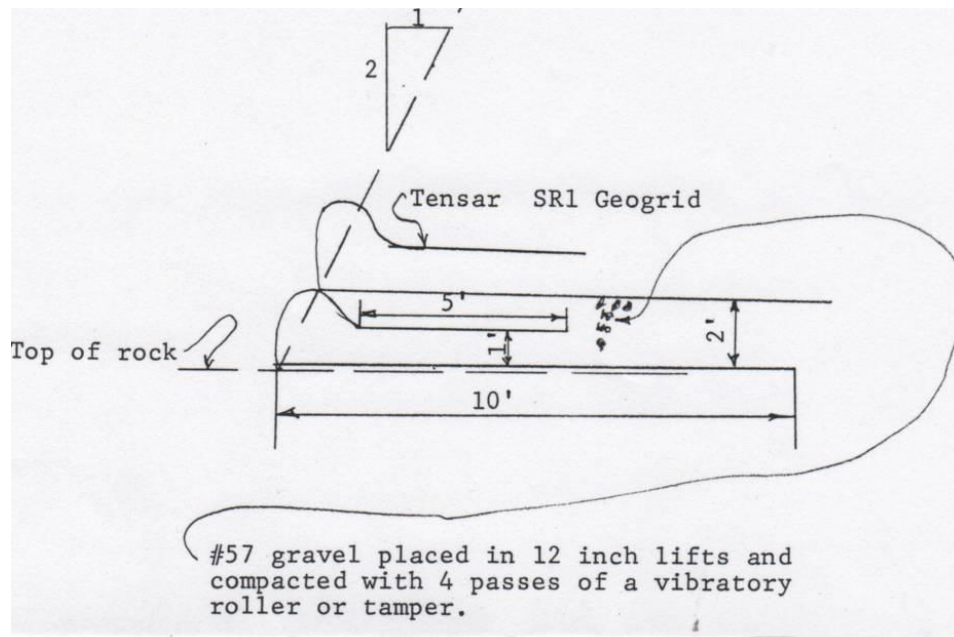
Schematic construction procedure for the geogrid reinforced slope
